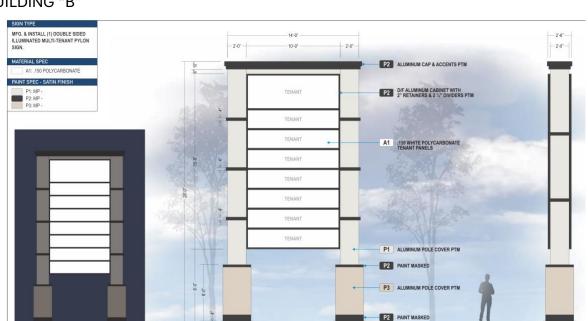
EXHIBIT "C" PROPOSED BUILDING MATERIALS
